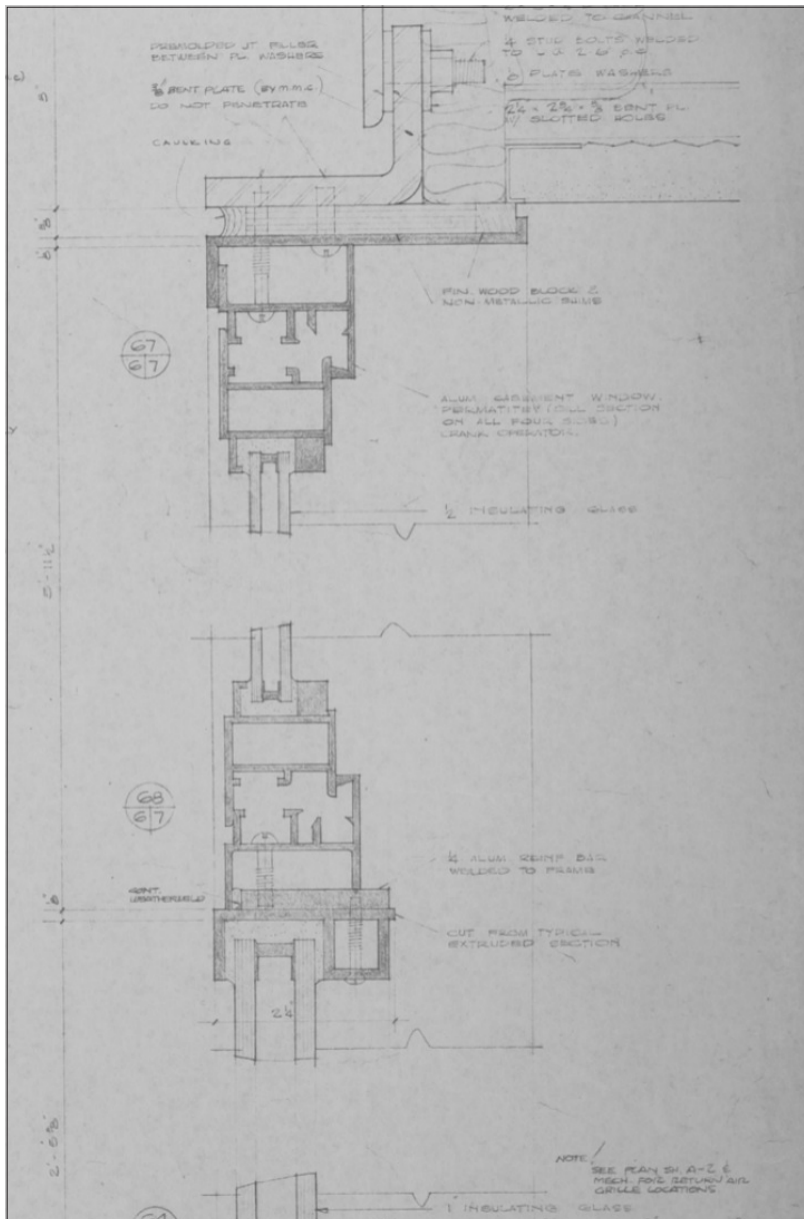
Sliding window details from sheet A-7. Date: February 18, 1955. Photo credit: MHG\_la\_B001\_f007\_025-101, Miller House and Garden Collection (M003), Newfields Archives
